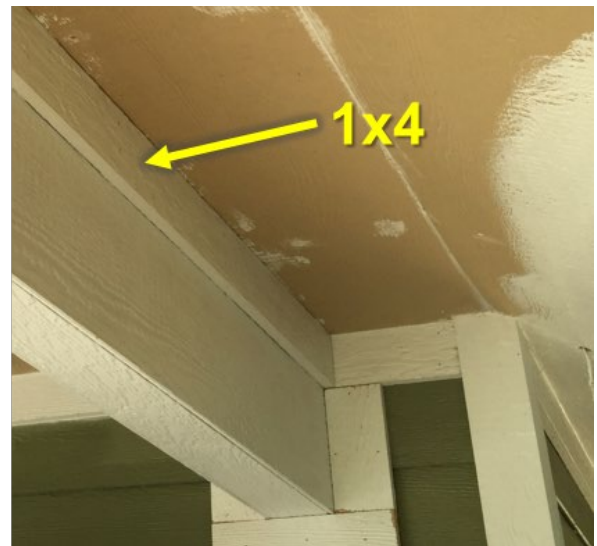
Porch Beam Trim at Ceiling and Soffit
